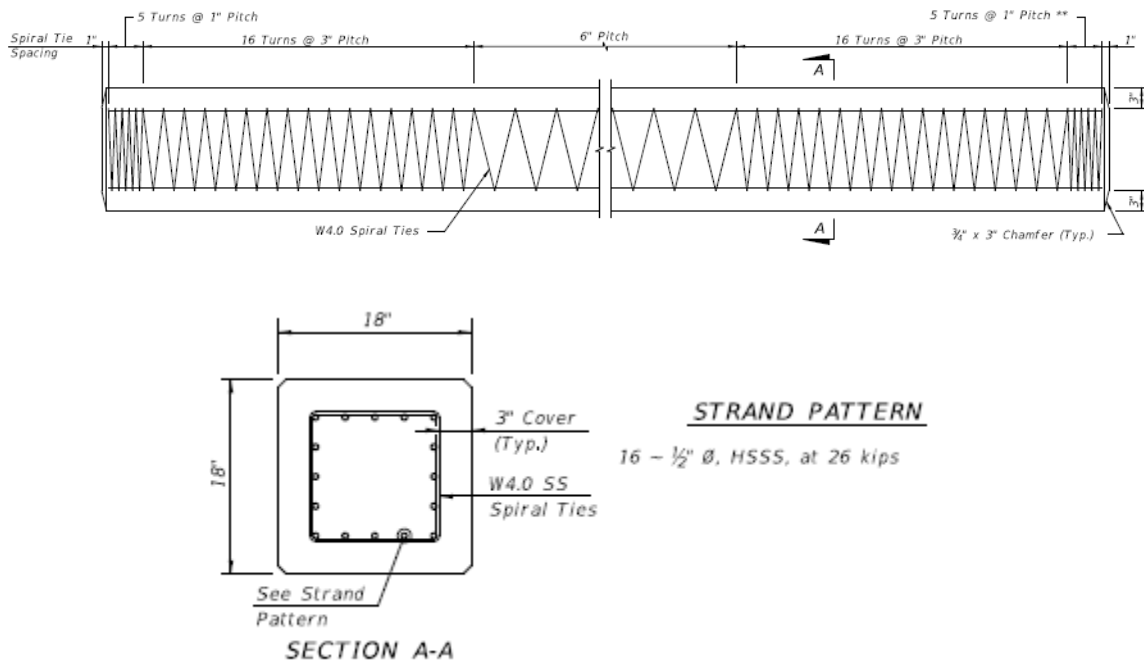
Details of prestressed concrete pile using HSSS strands and SS ties [31]
